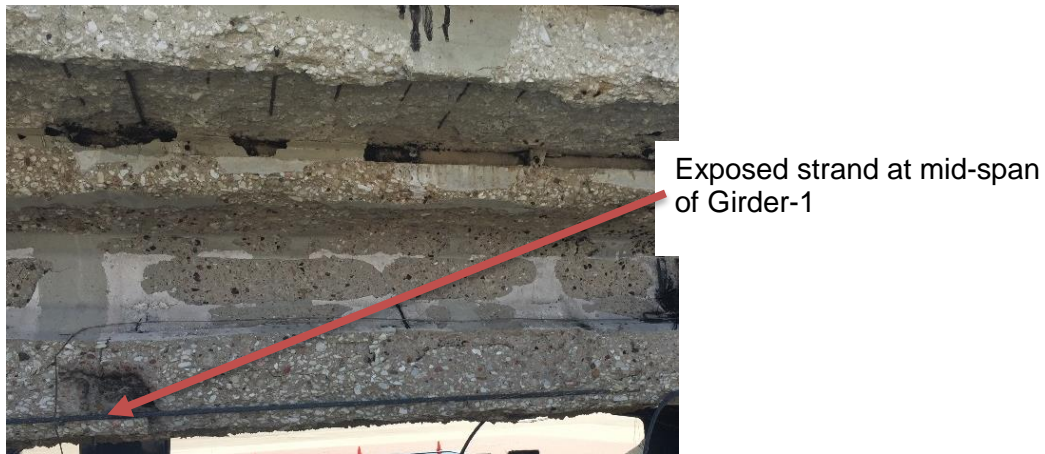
reference point used for measuring the elevation of the mid-span of Girder-1 after the fire
